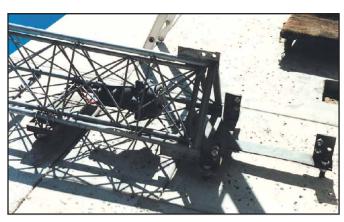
The tower is positioned before attachment to the hinge. The rotator is positioned inside the tower's bottom and is ready to be maneuvered to the other end. Just left of the rotator, one of the two wheel sets support the tower.
